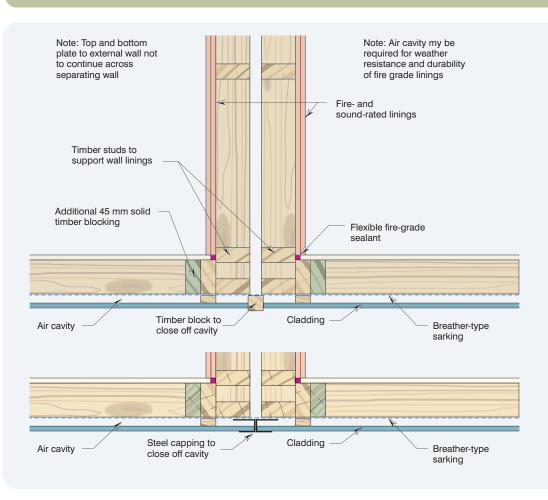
Fire- and sound-rated wall abutting a non-rated lightweight external wall – FRL 60 minutes – plan view.
